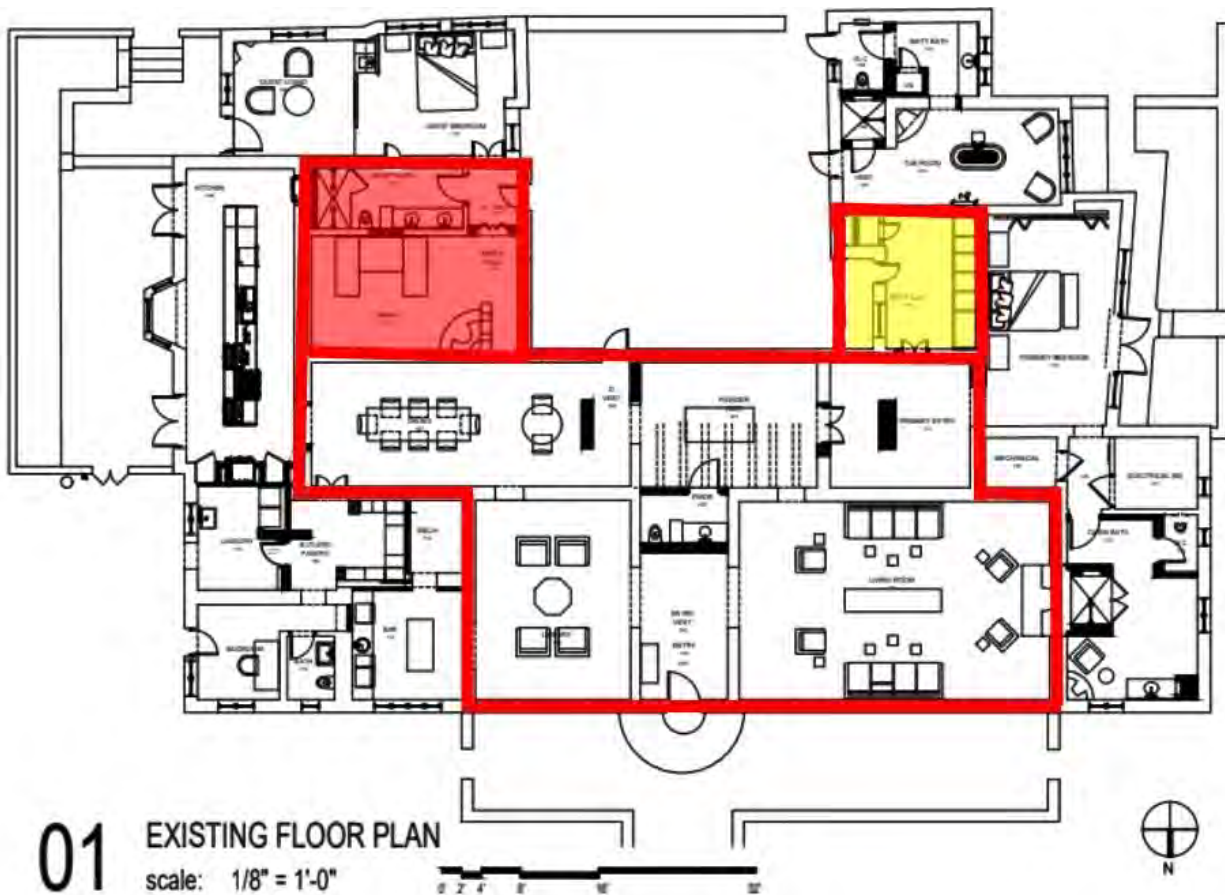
Existing floor plan. Red lines indicate assumed Austin/Meem era wall perimeter footprint, based on the 1925 John Gaw Meem drawings and 1925 construction photography. Solid yellow indicates an area where the walls have been modified; red where a room was likely added after initial construction but is shown in Meem’s floor plan.
